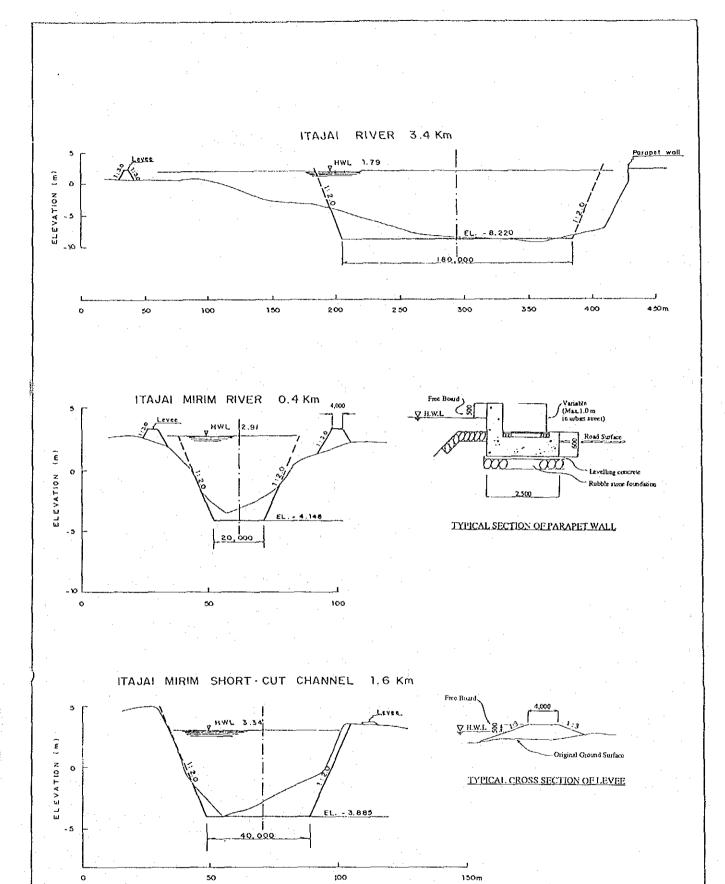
TYPICAL CROSS SECTION OF RIVER IMPROVEMENT IN THE PROJECT STRETCH
